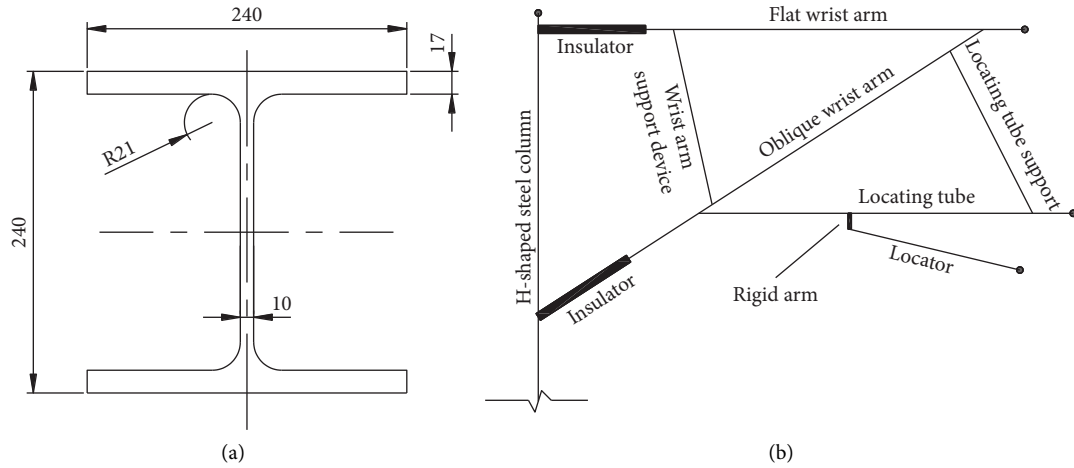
Schematic diagram of the wrist arm system. (a) Section dimensions of H-shaped steel column (unit: mm). (b) The structure of the wrist arm system.
